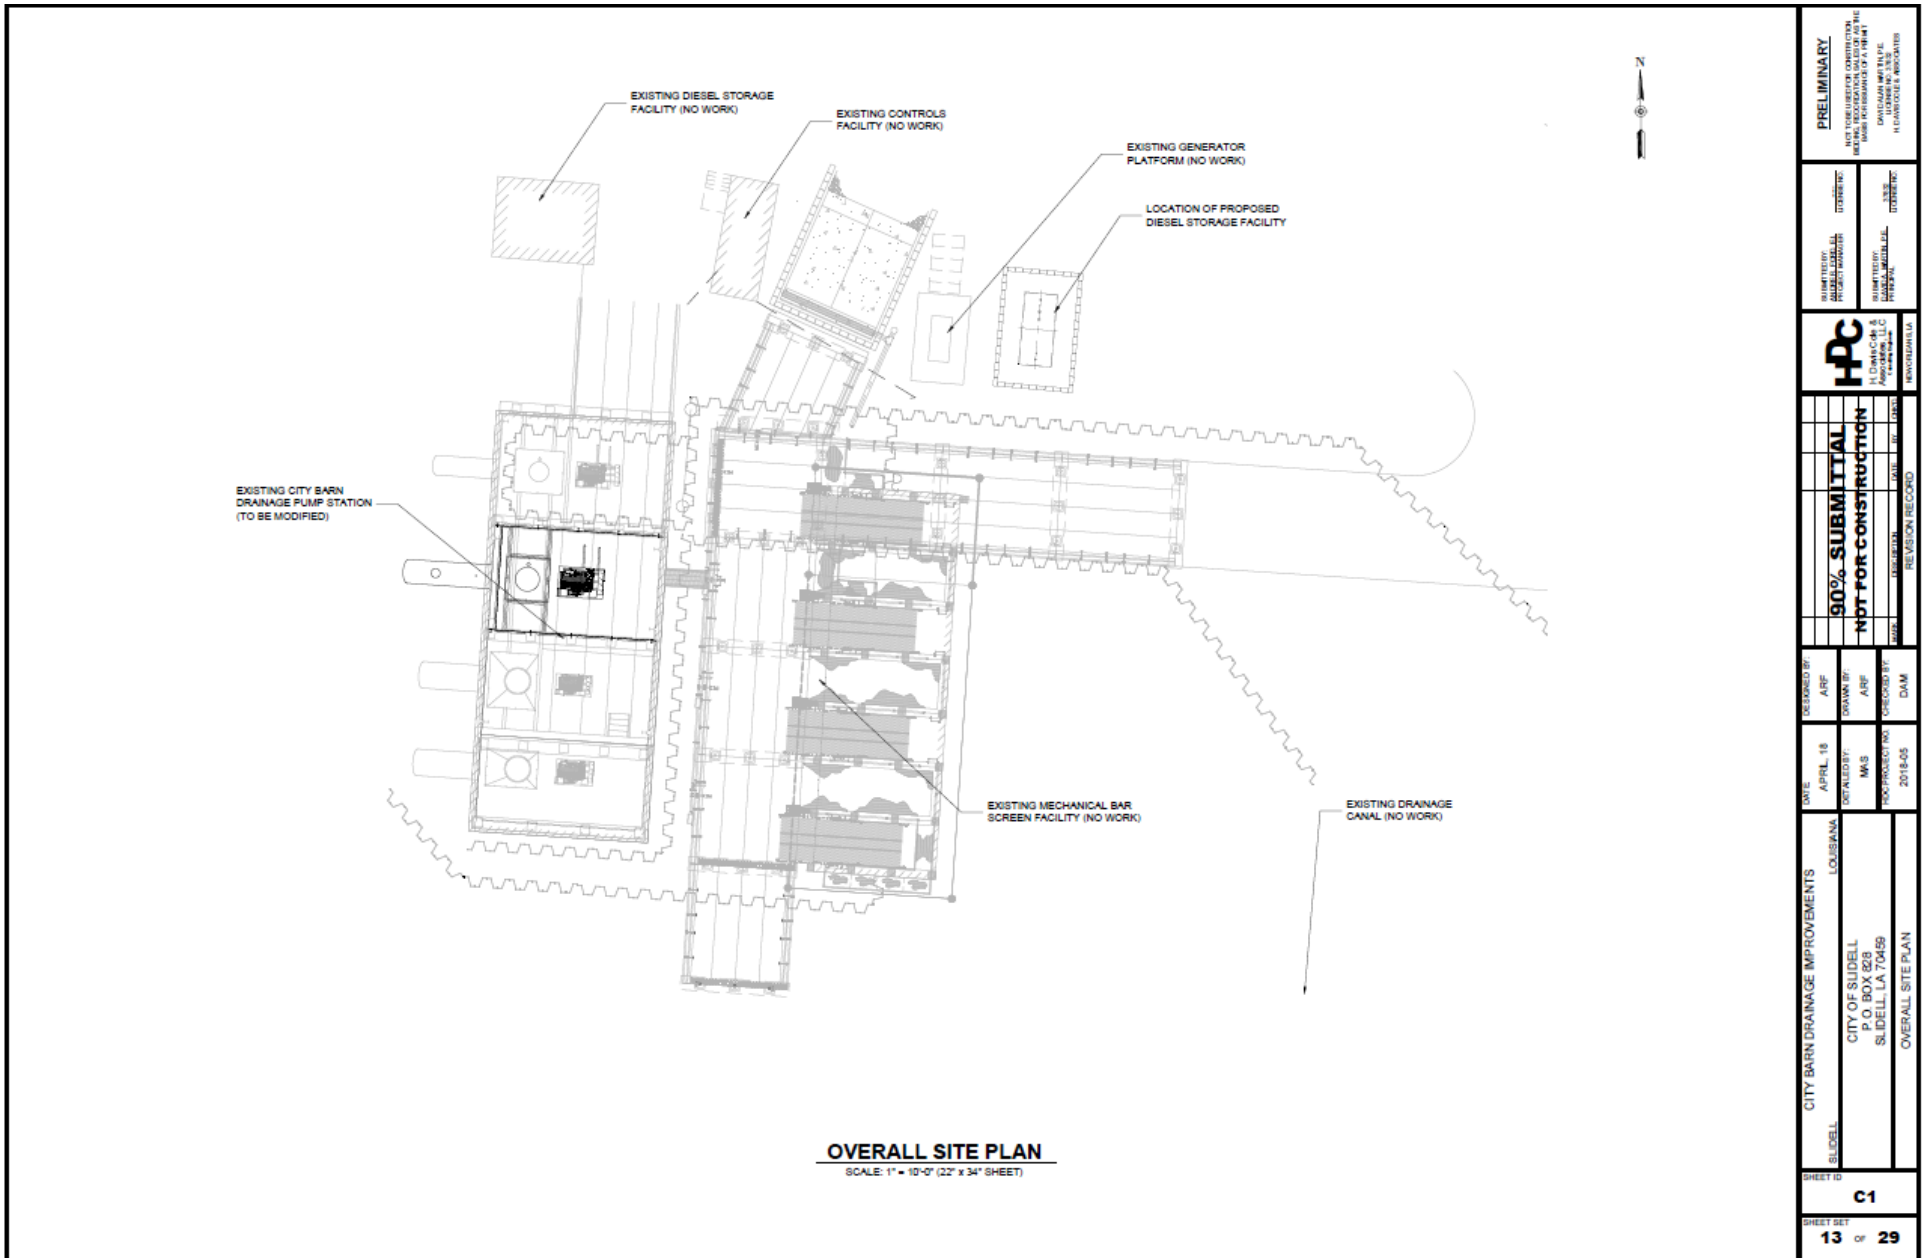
Plan View Drawing of Proposed CBPS Project Site.
